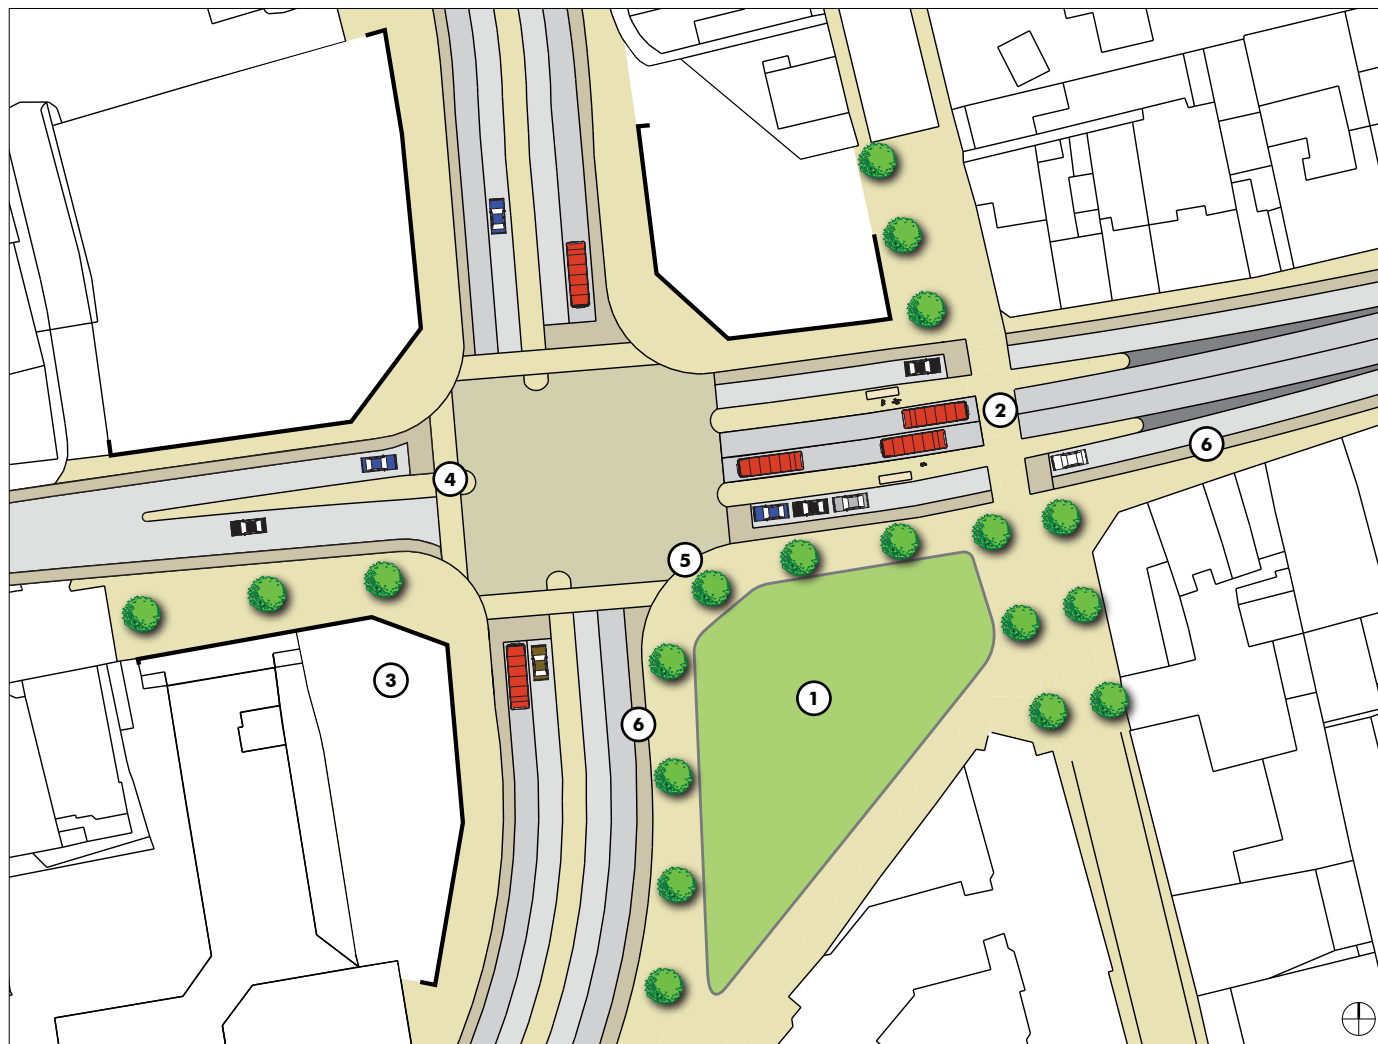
Key Project 1 - Illustrative proposal for the remodelling of Elizabeth Way roundabout
